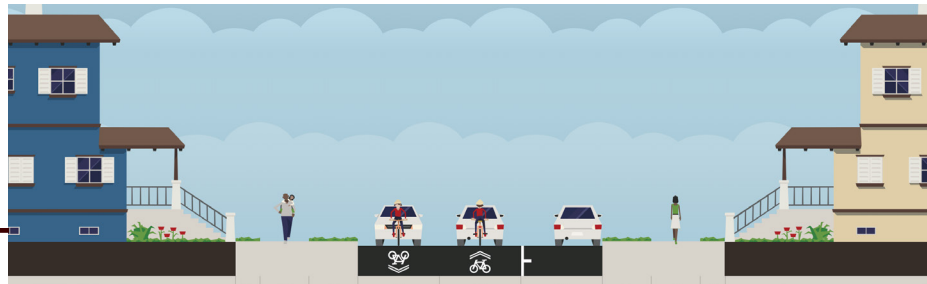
Potential recommendation for French Street, East 20th Street to East 38th Street
